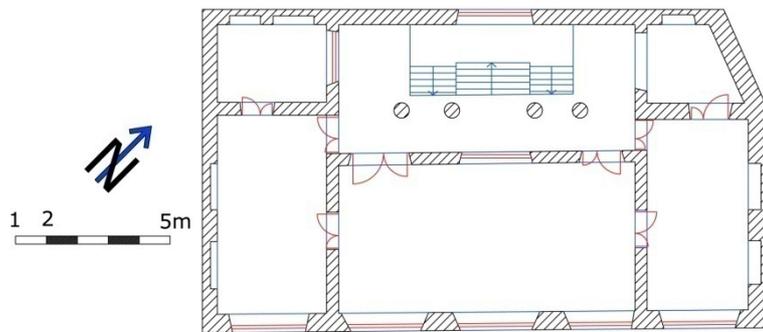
First floor plan, Source: Kasmaei 2005, p.83 (my drawings)
